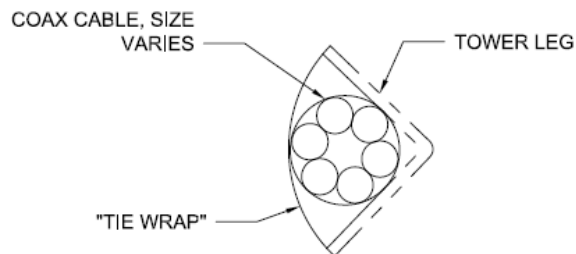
Cable Attachment Cross Section Details per Figure 3.6a
